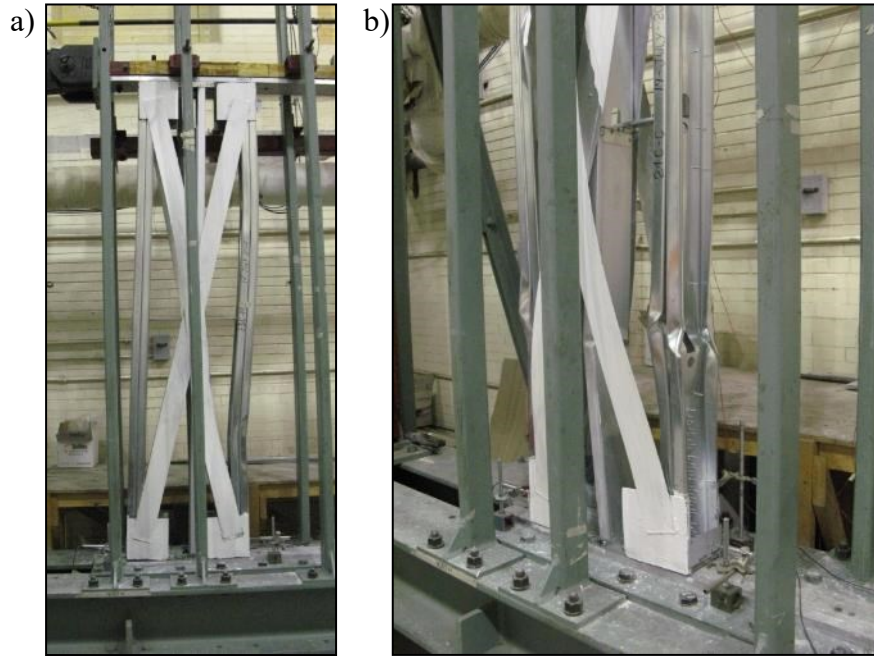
a) Double curvature bending of 610 x 2440 mm strap braced wall 23C-M2, b) Chord stud failure of wall 24C-C
